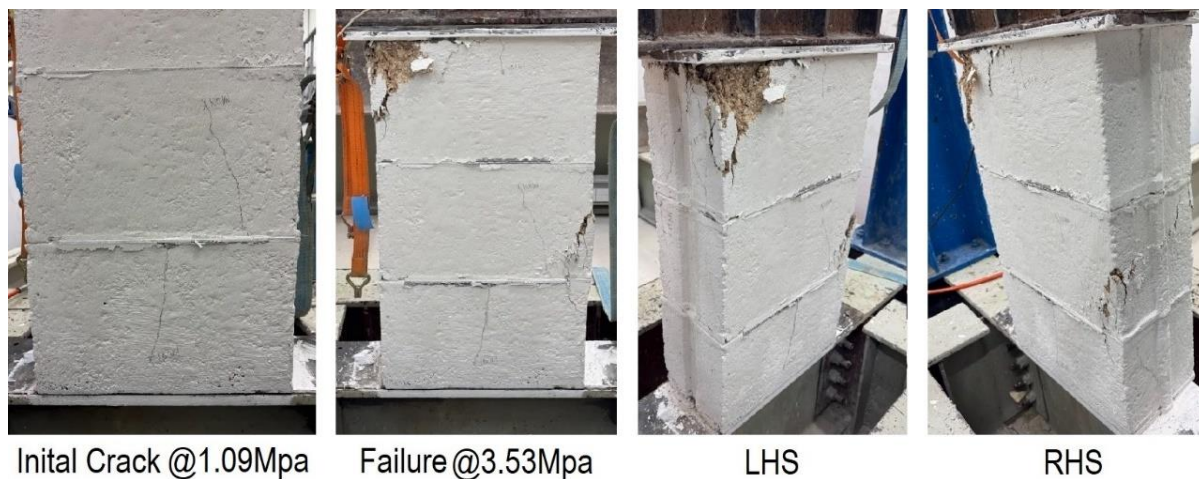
Initial Cracking and Failure in Fully Embedded Steel Wallette
